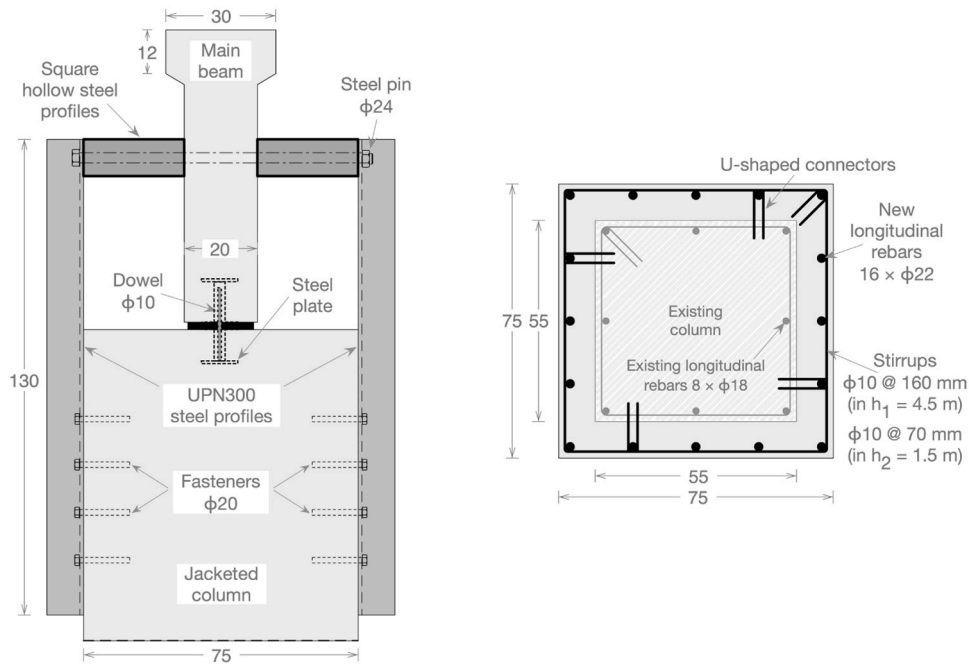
Building EE1 – elevation and cross section of concrete jacketing. (Units in cm, unless otherwise specified).
